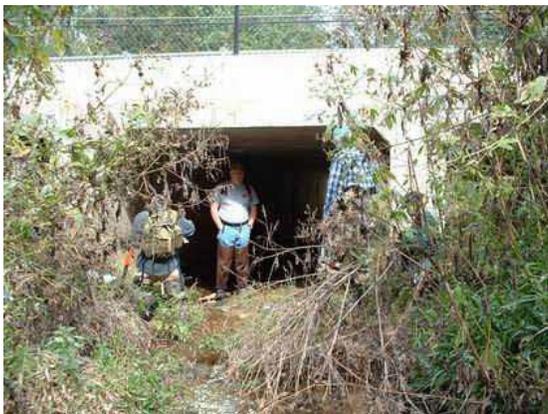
Five 12' x 8' concrete box culverts located under Collingwood Road to convey North Branch main stem flows
